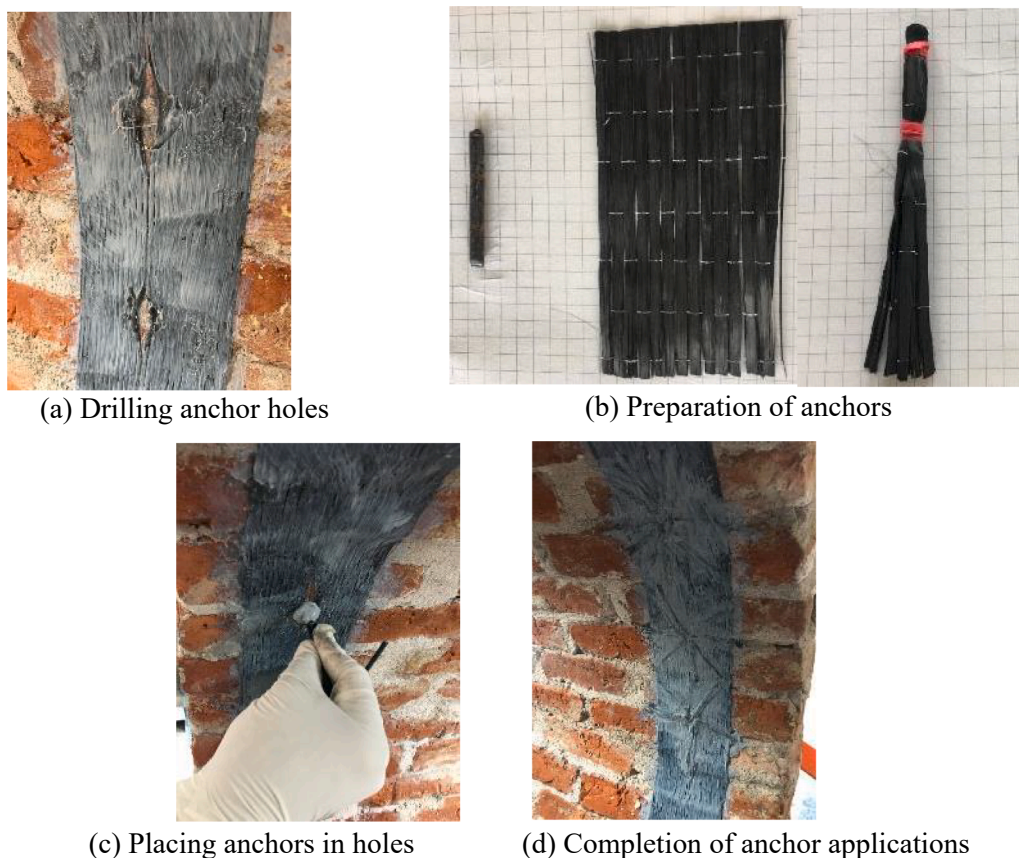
Anchorage application, a) Drilling anchor holes, b) Preparation of anchors, c) Placing anchors in holes, d) Completion of anchor applications.
